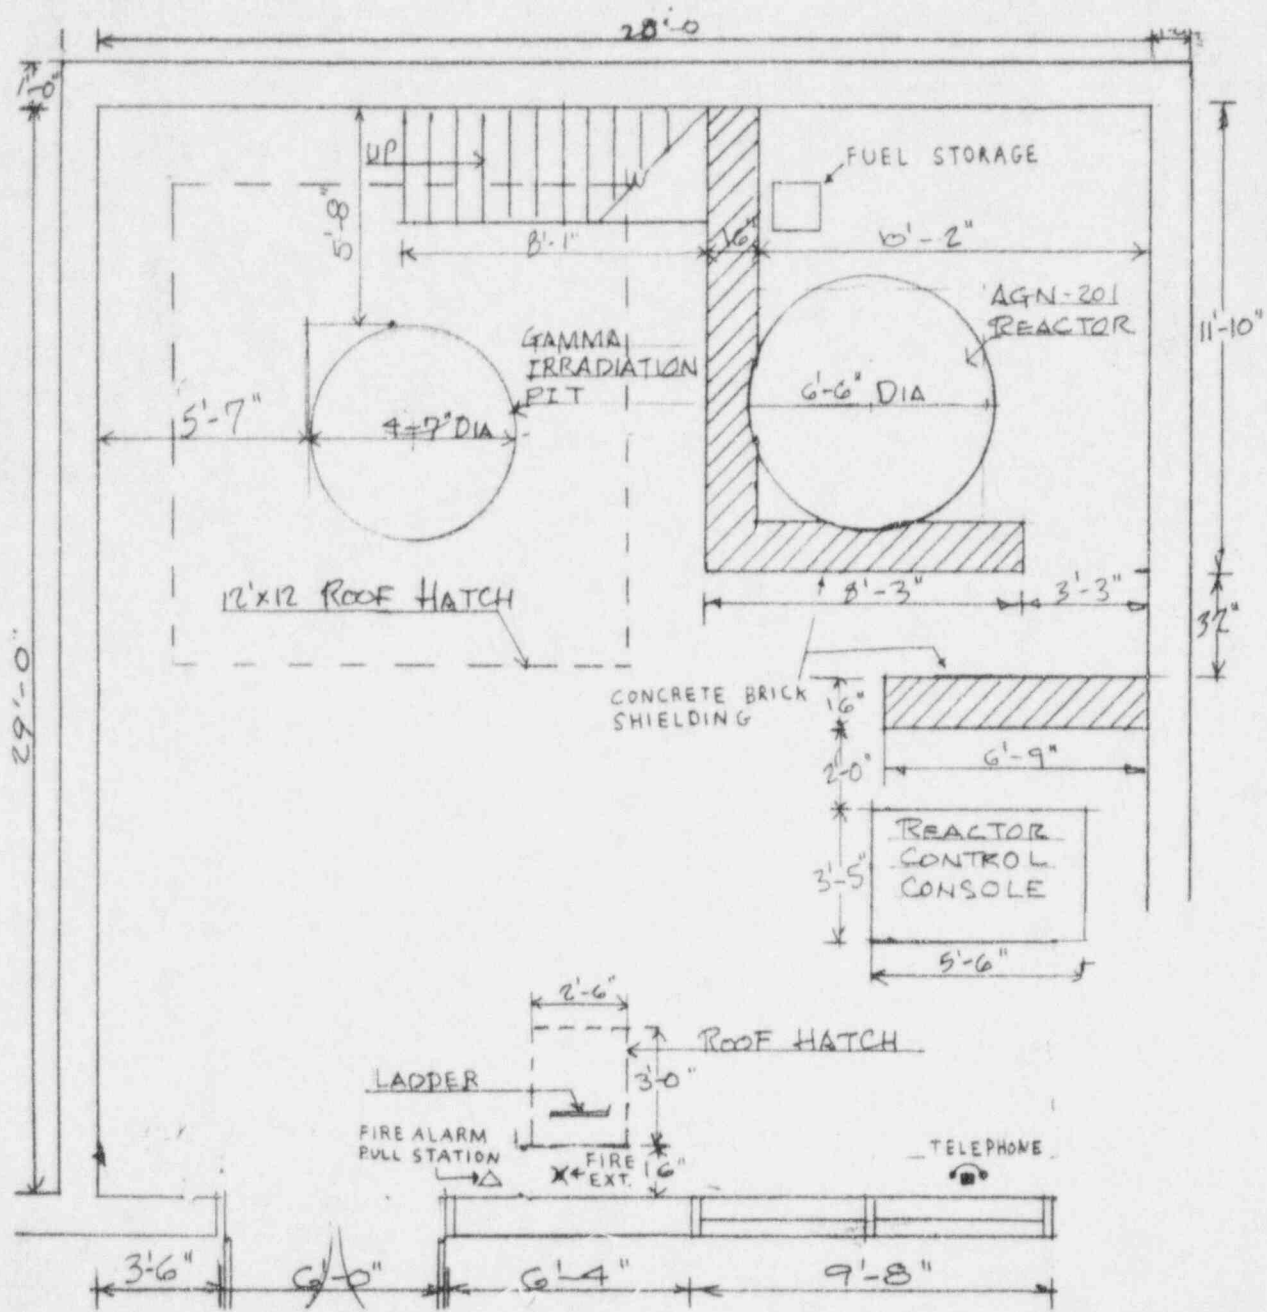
Reactor Laboratory Floor Plan (basement).
